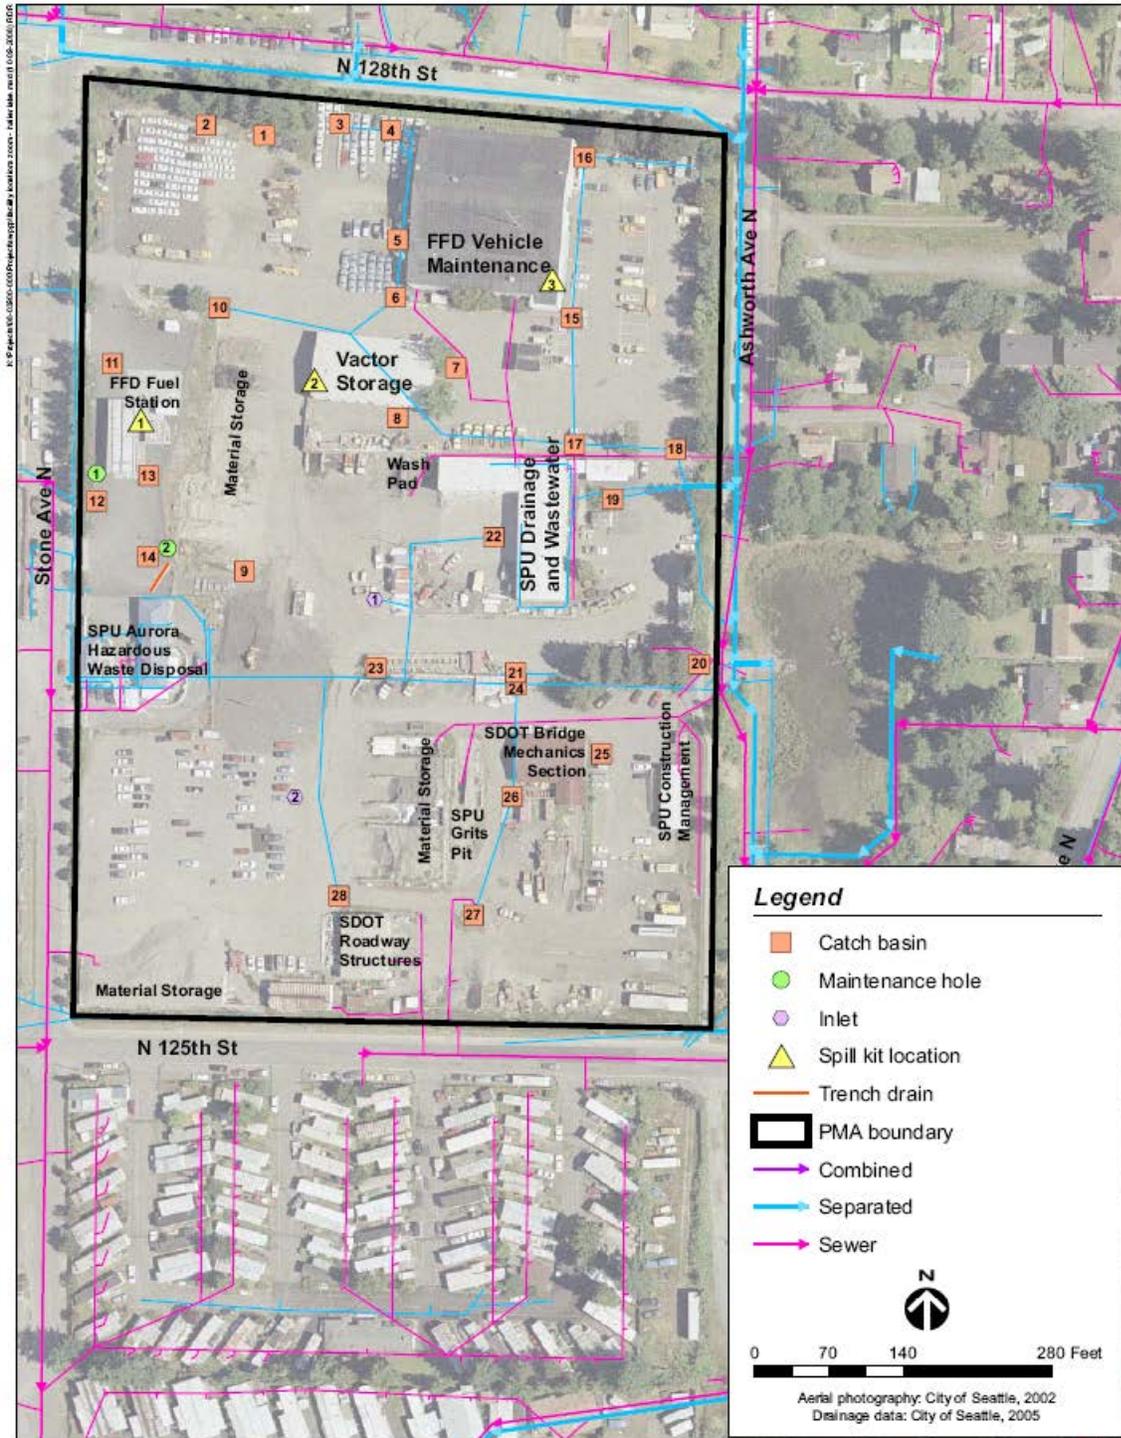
Haller Lake Shops Complex (PMA 691) site drainage plan, Ashworth Ave N & N 127th St., Seattle, Washington.
